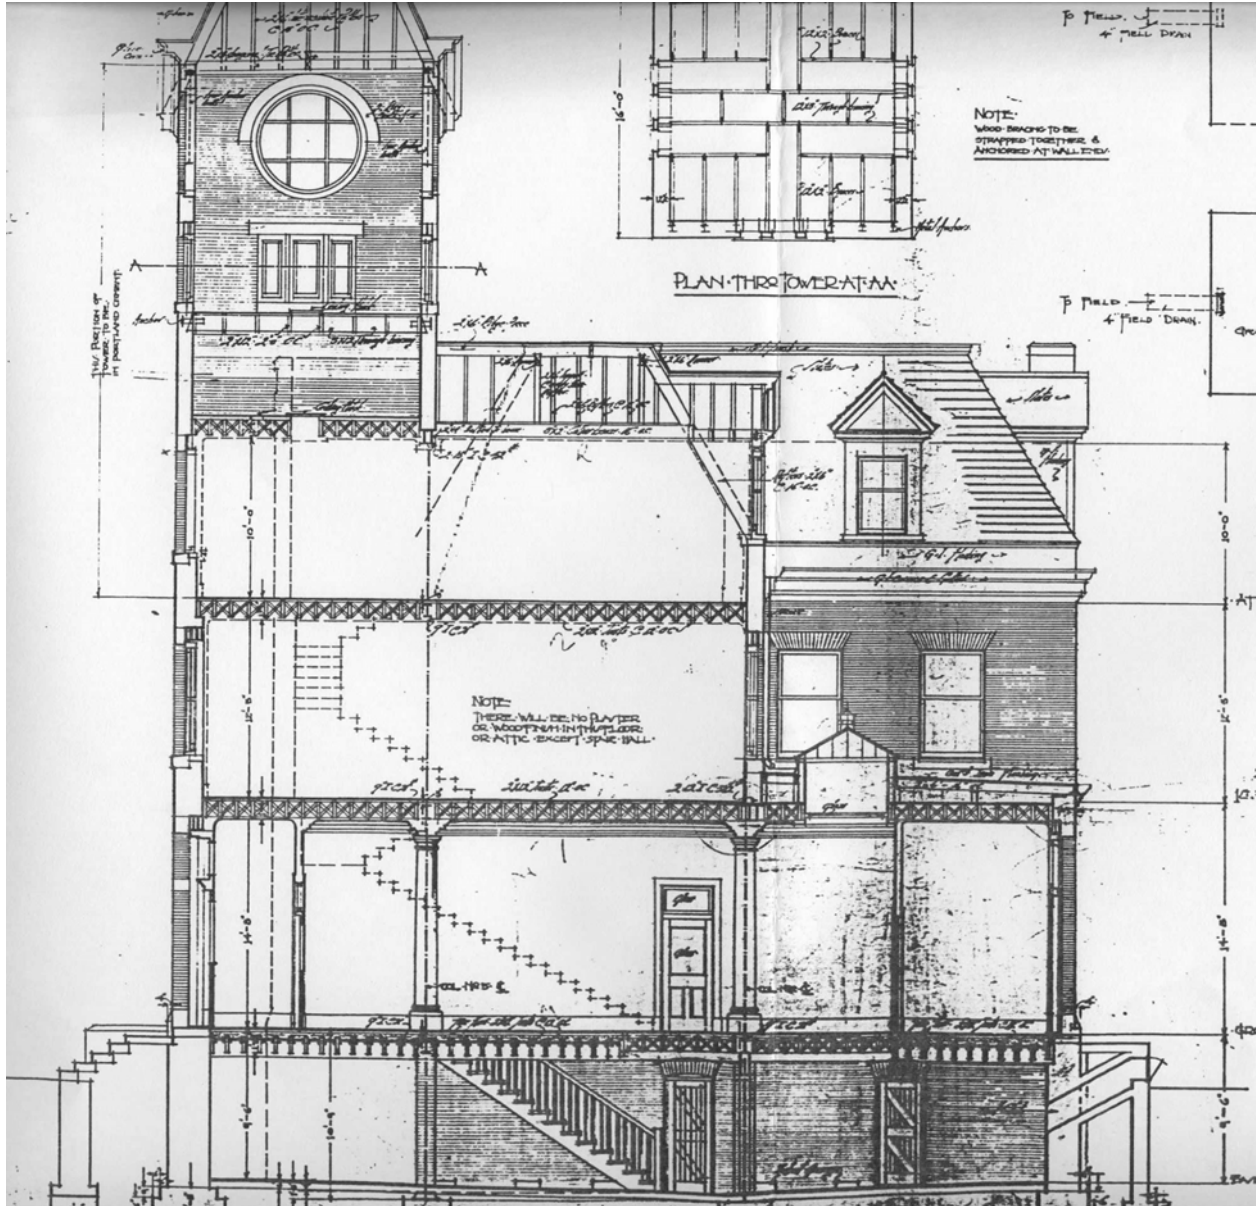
Drawing No. 7 (1911): Section running north-south through the central skylight, looking east. Shows the construction of the tower as originally proposed with one less floor. The wood bracing for the tower (section A-A) is located directly below the space where a bell could be hung and no floor is shown for a clock dial room. Presumably, once a bell/ clock assembly had been ordered, this section would have been revised to reflect changes need to accommodate all of its components. In the case of the Dundas Post Office an entire extra storey was added but there are no available drawings showing this modification.
